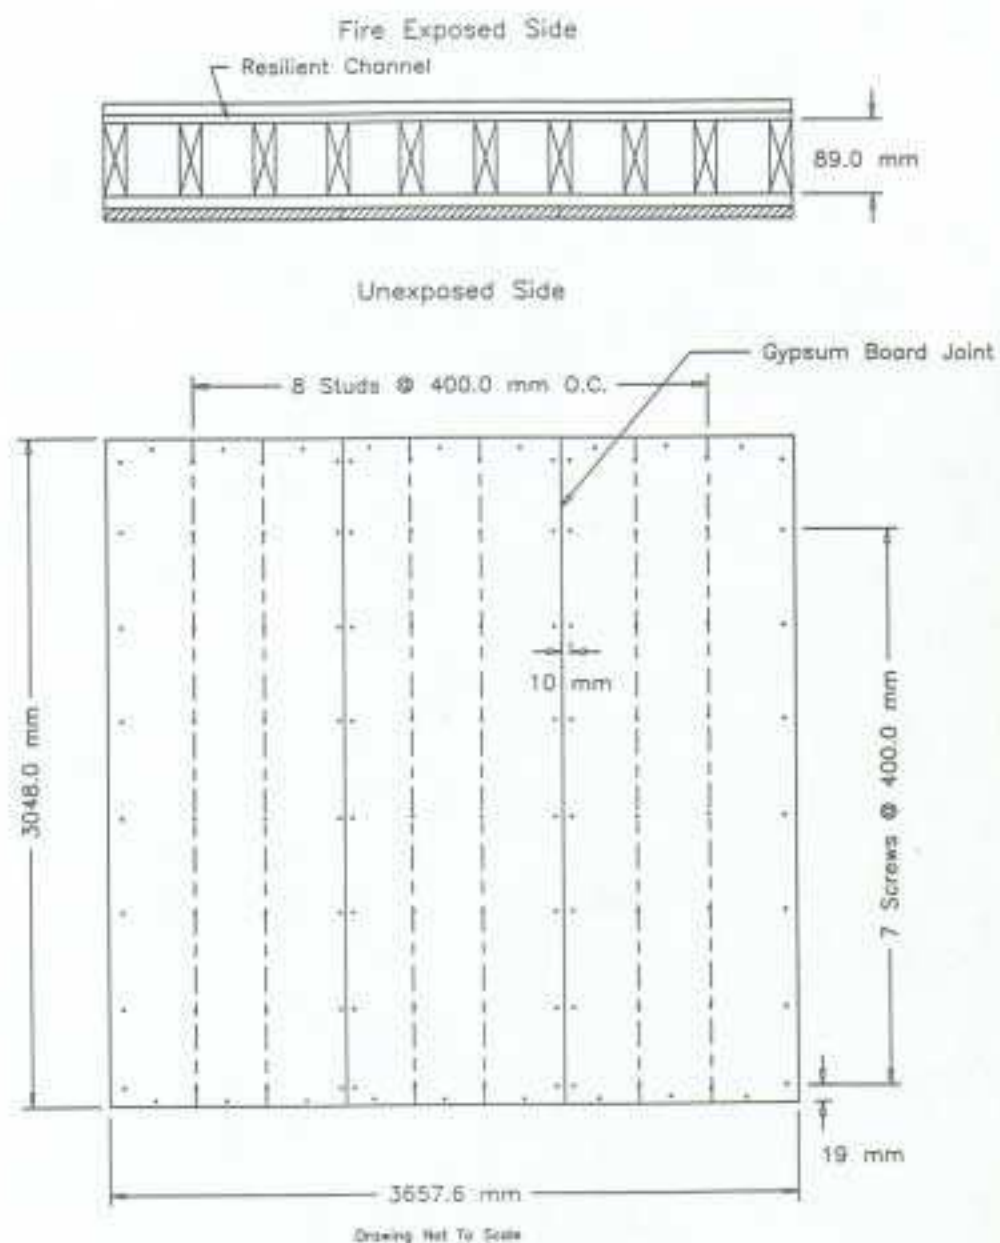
Screw Locations For Wood Stud, 1x2 Gypsum Board Layers, Full-Scale Assembly, Resilient Channel on Exposed Side (Face Layer Unexposed Side)
